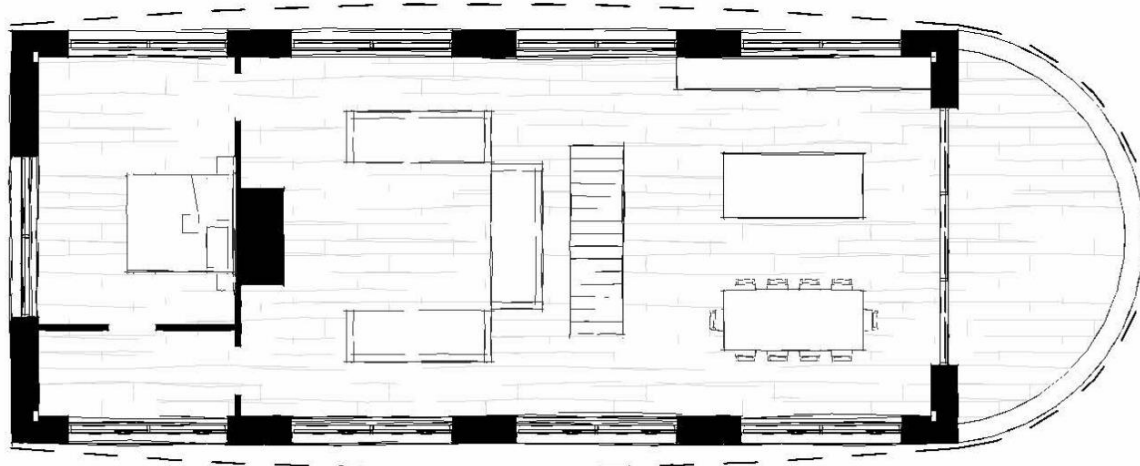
Design Concept floor plan of the preliminary scheme.
